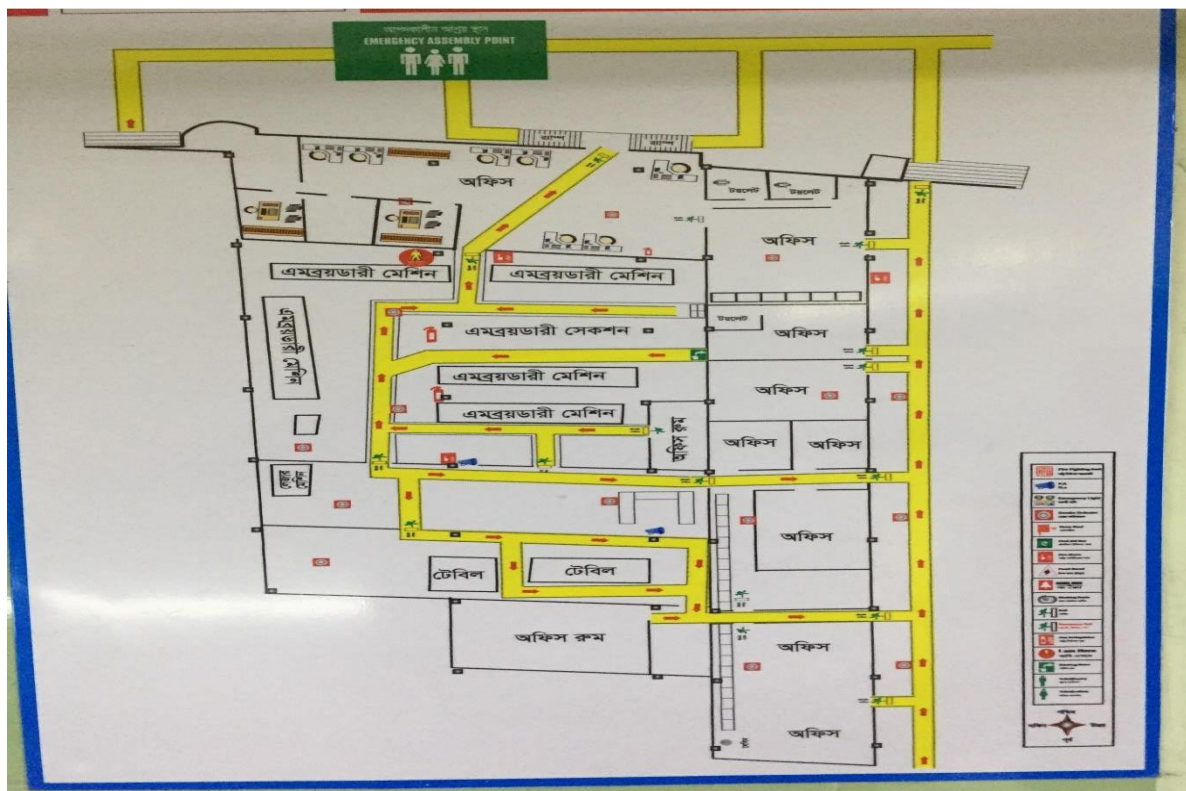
8. 2 Embroidery section layout & emergency evacuation plan
